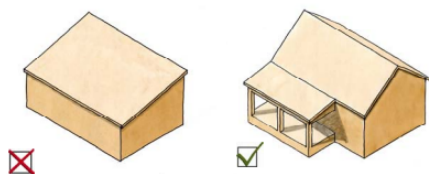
Monopitch or shed roofs should be avoided unless part of a subordinate element.
